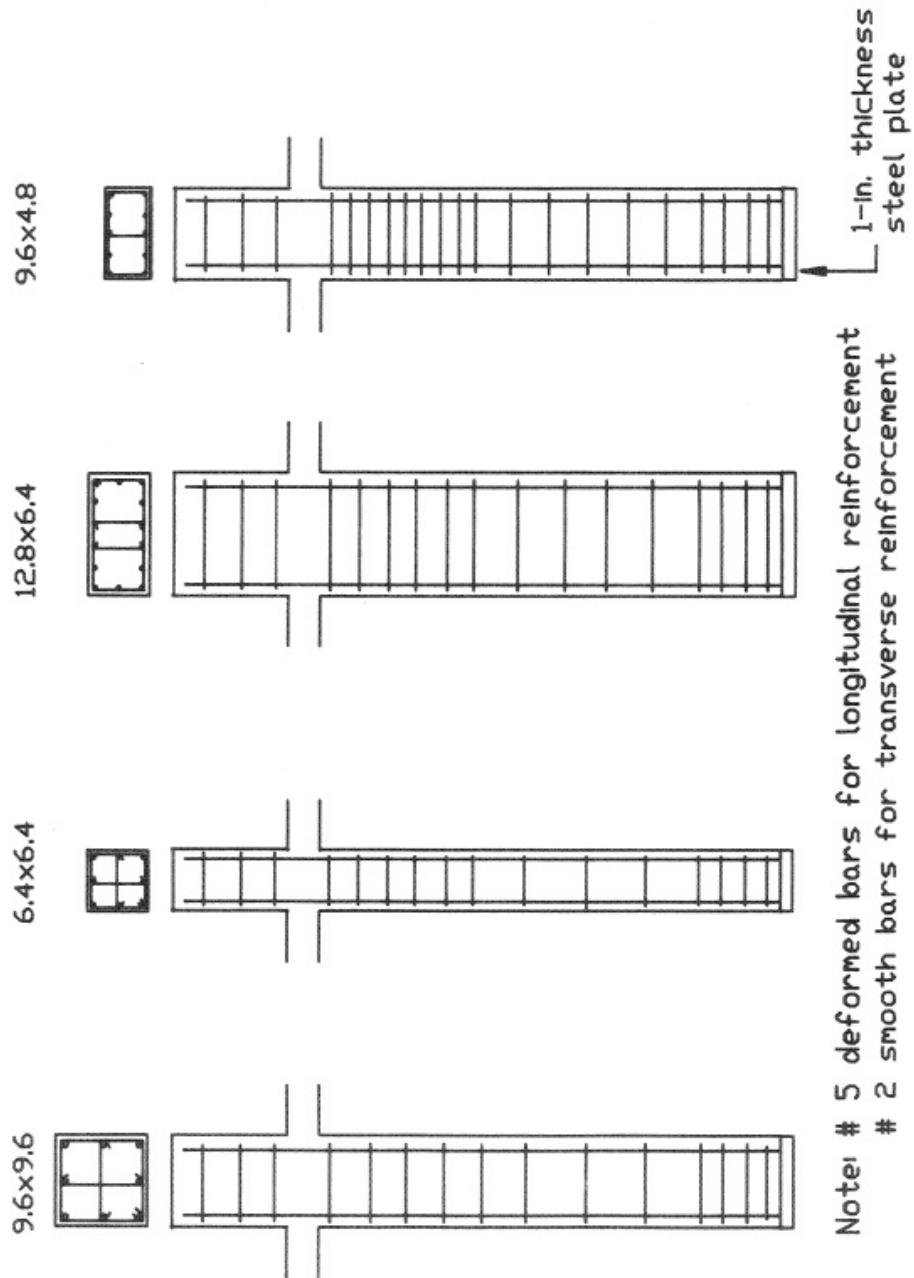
Column reinforcements of model slab (units of measure in inches)
